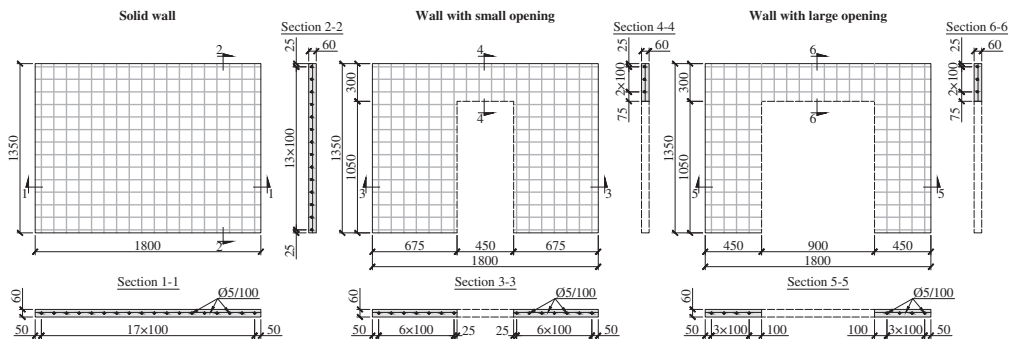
Specimen dimensions and reinforcement details (dimensions in millimeters)
